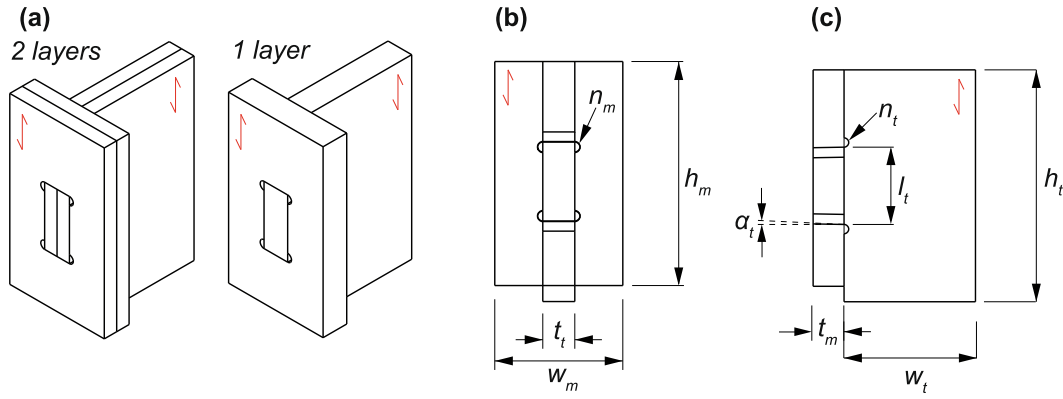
TT shear specimens: (a) Axonometries of single- and double-layered type/ (b) Front view/ (c) Side view.
